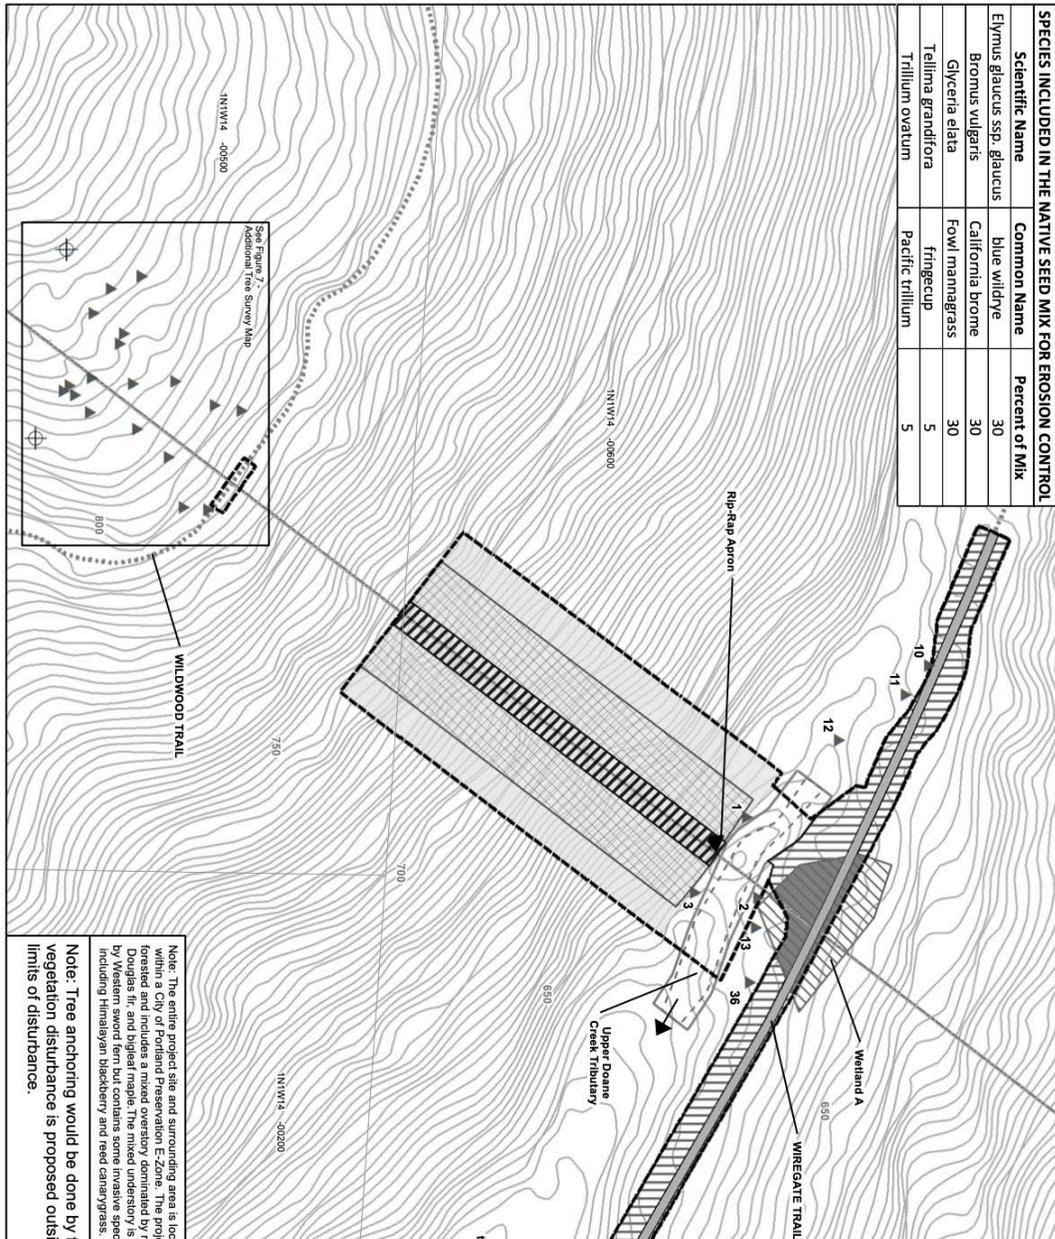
A - SITE MITIGATION PLAN/TREE PLAN (TREE PLANTING AND DOWNED WOODY DEBRIS/BRUSH PILES)
